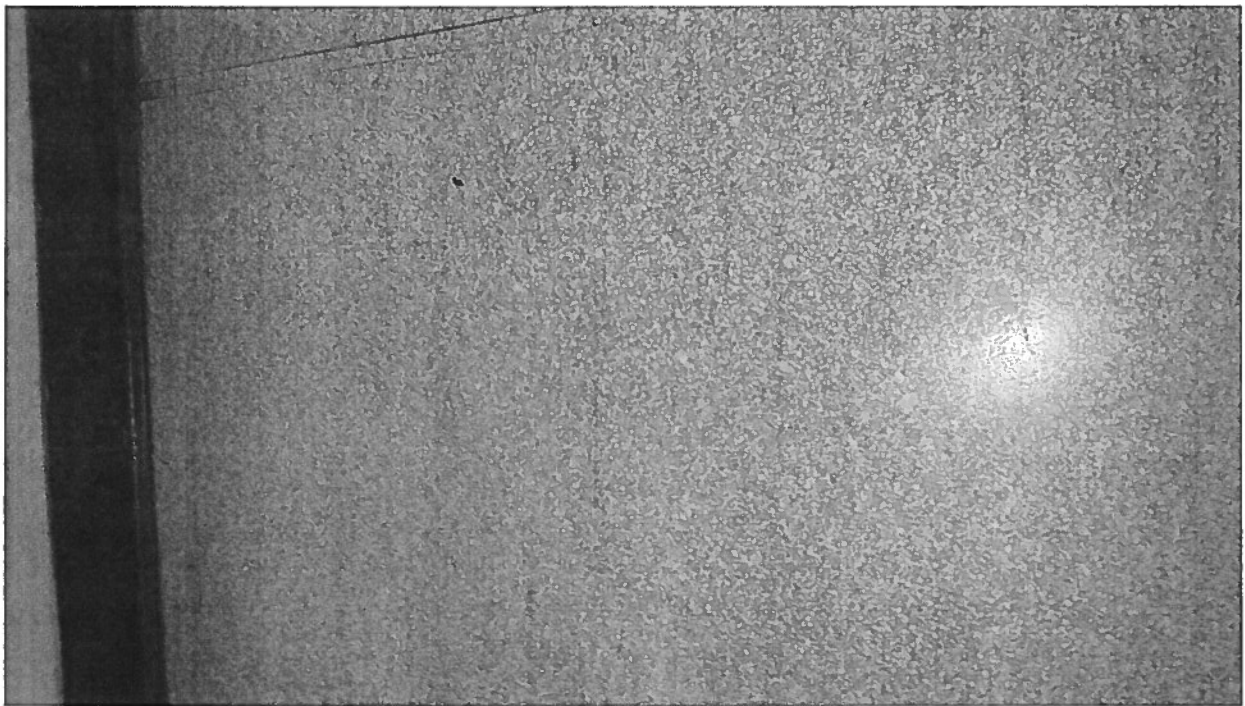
ACM Sheet Vinyl Flooring with Stone Pattern and Paper Backing.
